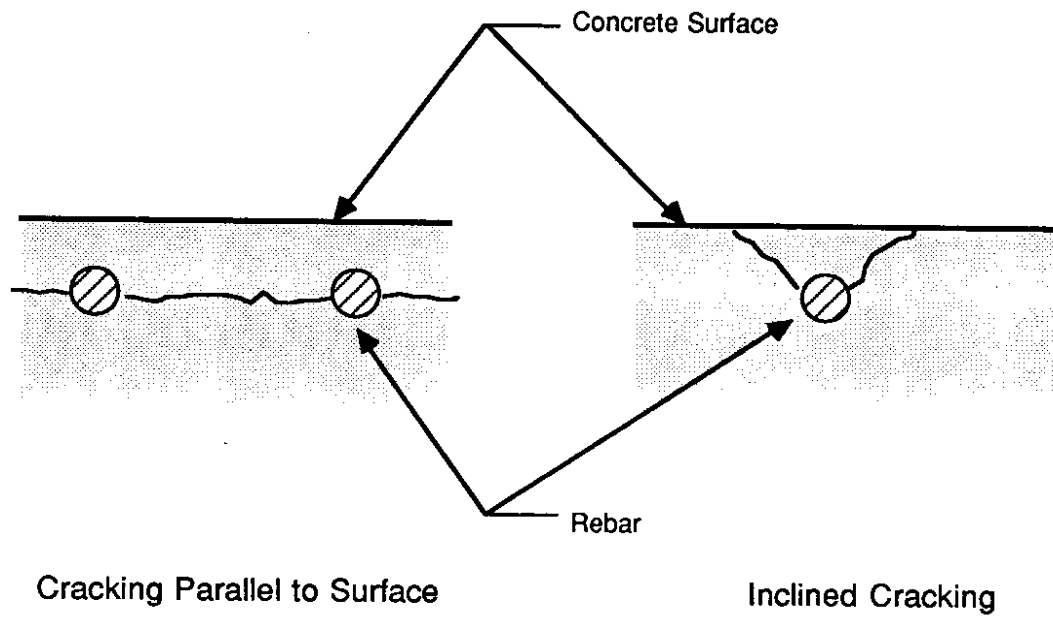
Modes of Concrete Cracking Due to Rebar Expansion.
